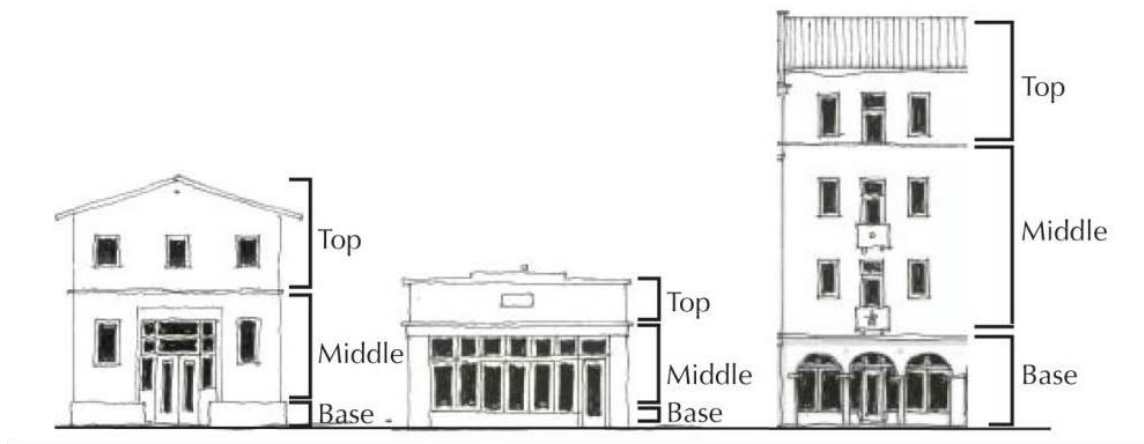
F-1 Façade Articulation Proportions
